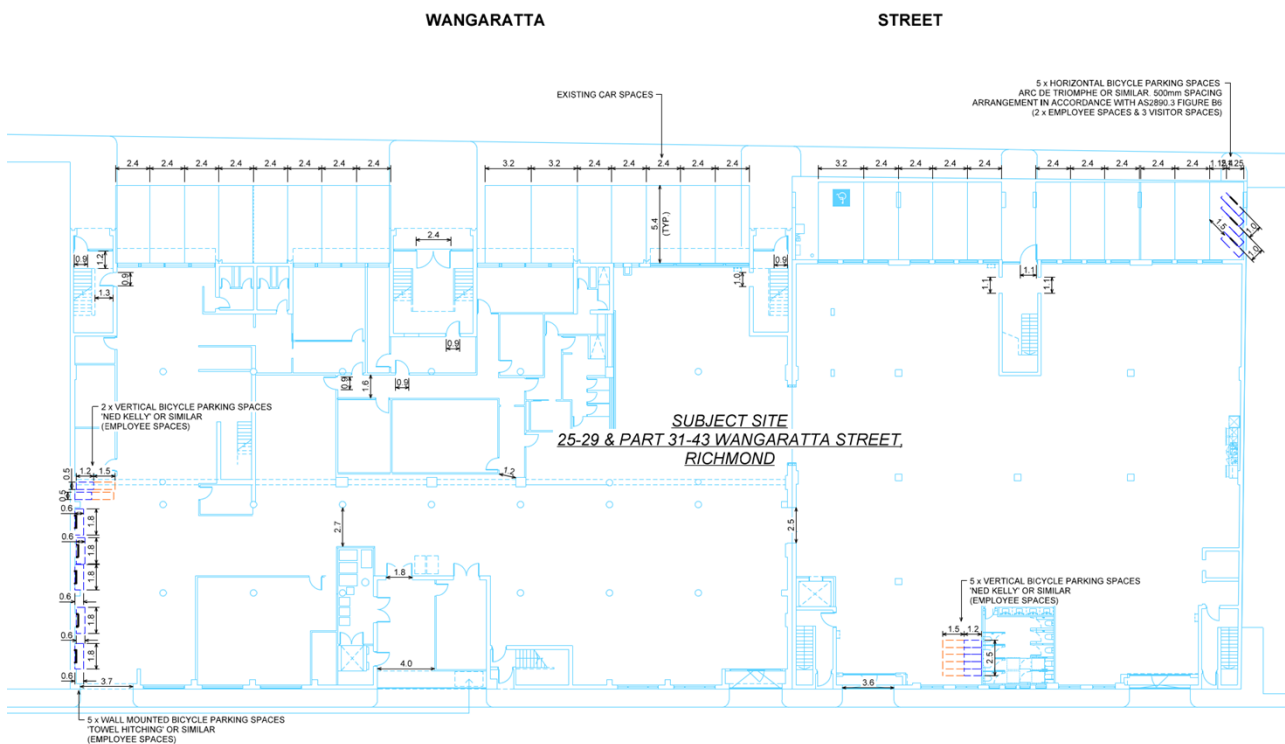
Revised parking layout including external bicycle parking spaces (Source: Application plans)
